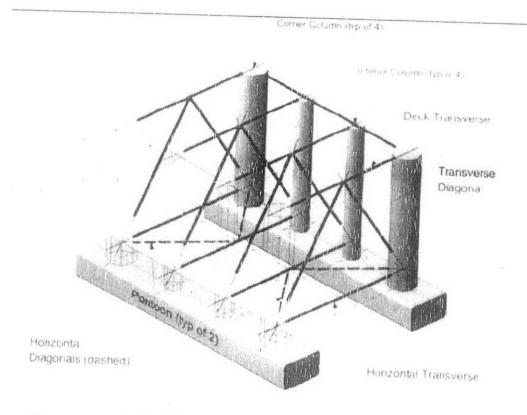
Typical 3rd generation semi-submersible bracing system
